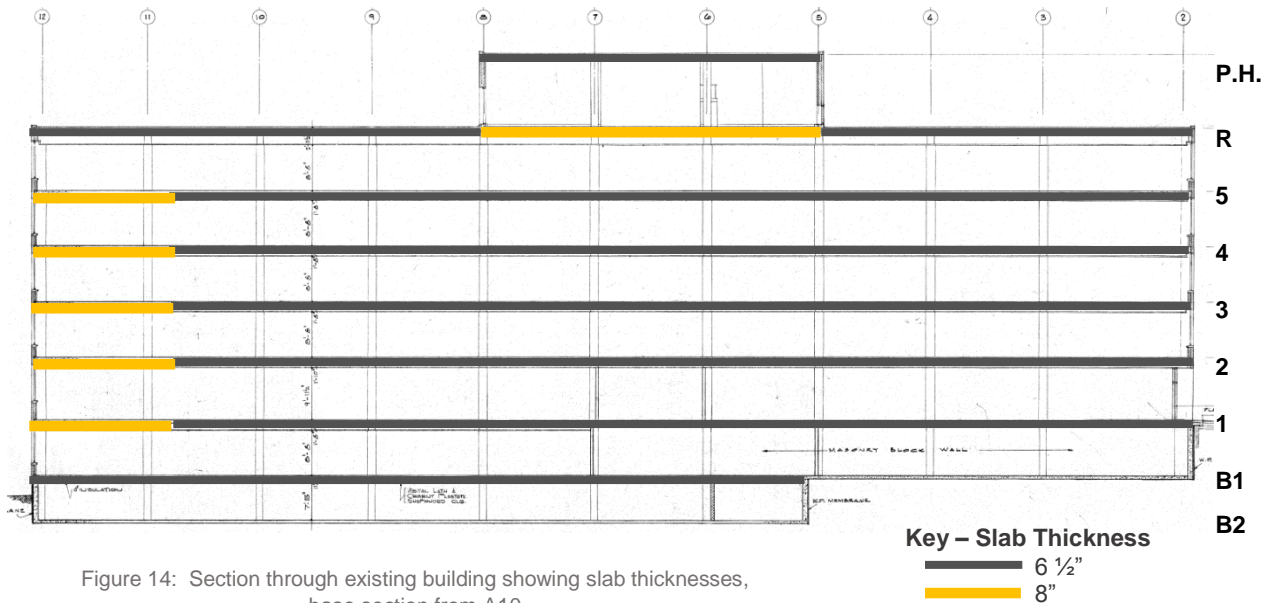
Section through existing building showing slab thicknesses, base section from A10
